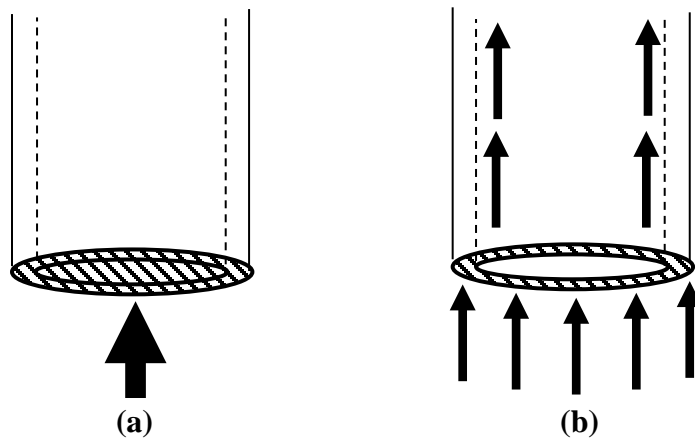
End bearing resistance considering (a) plugged condition and (b) unplugged condition
